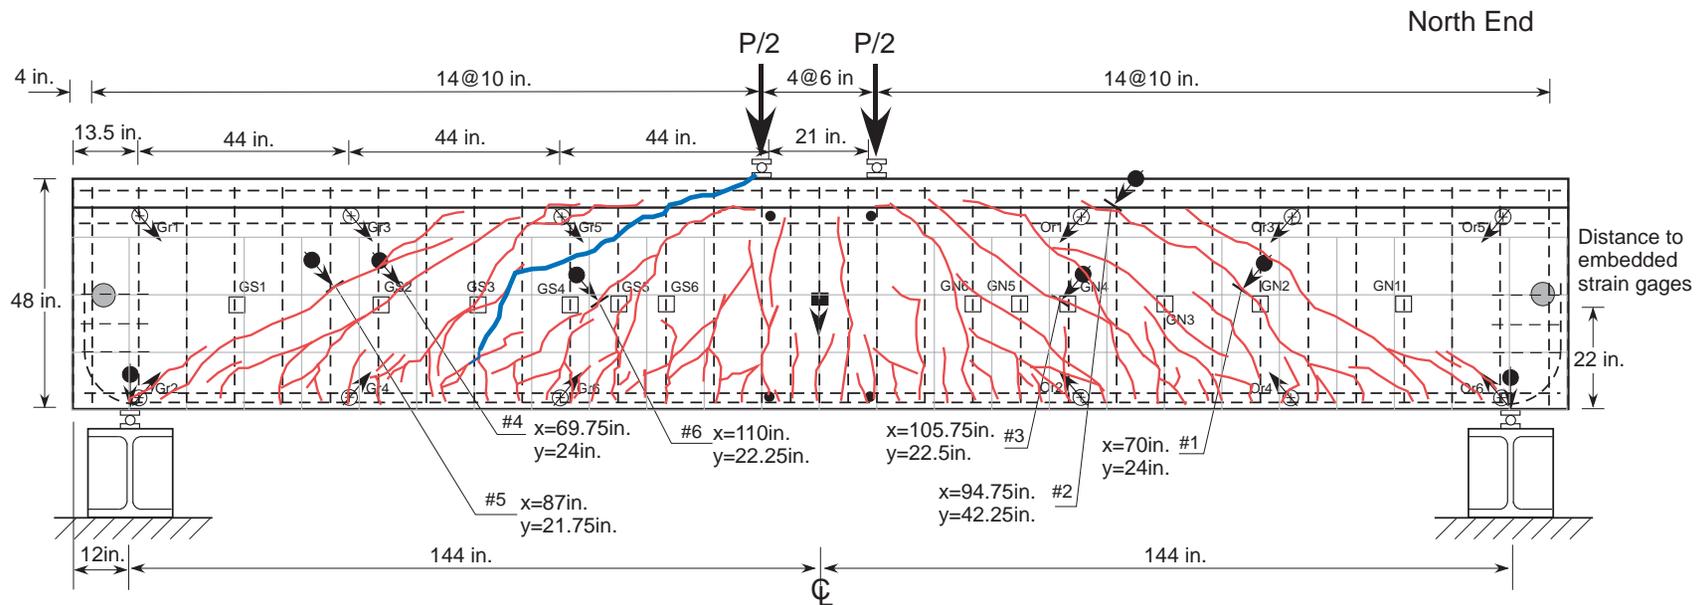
Instrumentation plan and crack pattern for specimen 1T18.
